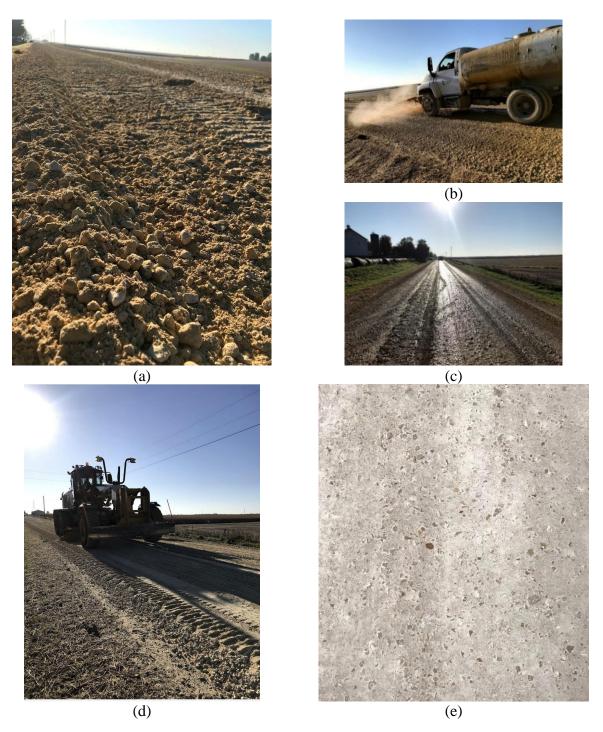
Construction of Clay Slurry test section in Jones County: (a) windrow to minimize runoff, (b) spray clay slurry, and (c) surface after spraying clay slurry, (d) blademixing surface materials, (e) finished surface
